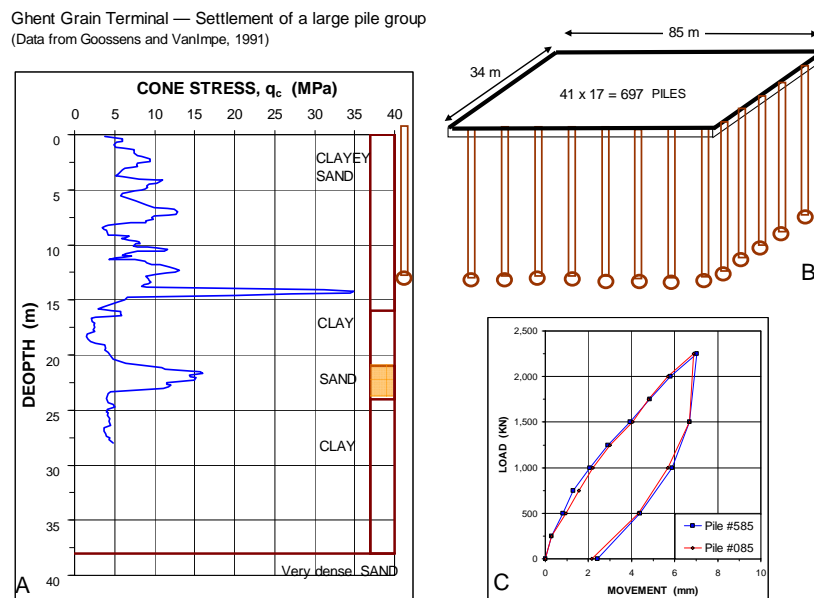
Soil profile (A), pile group (B), and load-movement in two static loading tests
